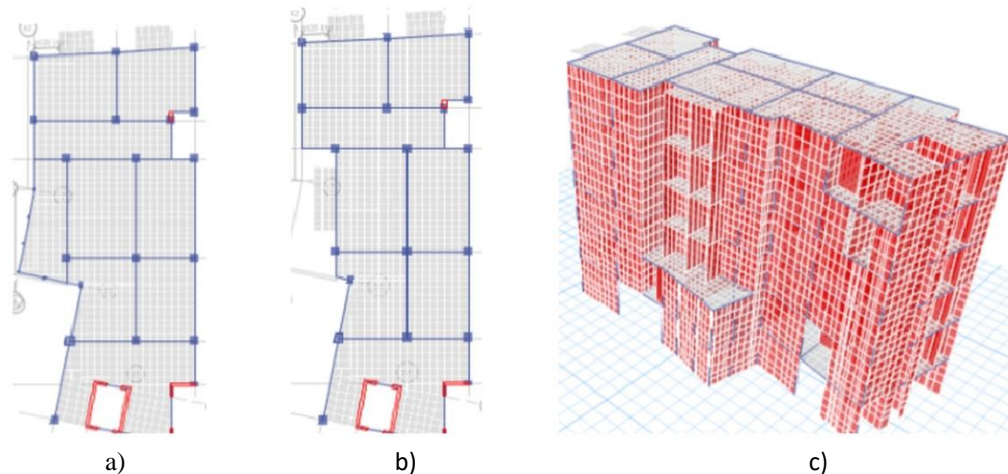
Building layout: a) ground floor; b) upper stories; c) 3D model.
